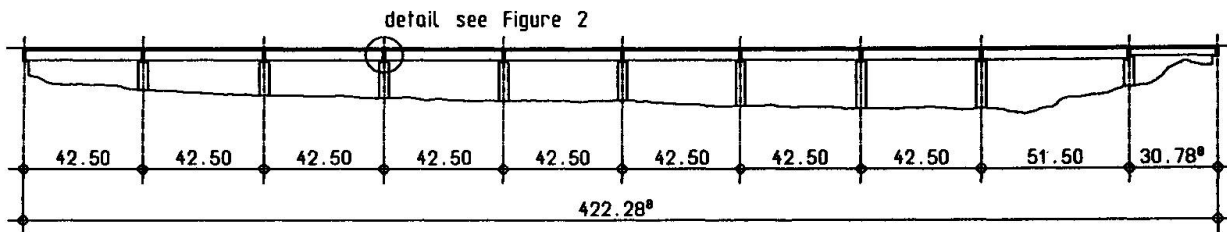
Elevation of structure of Sinntal Bridge Schaippach
